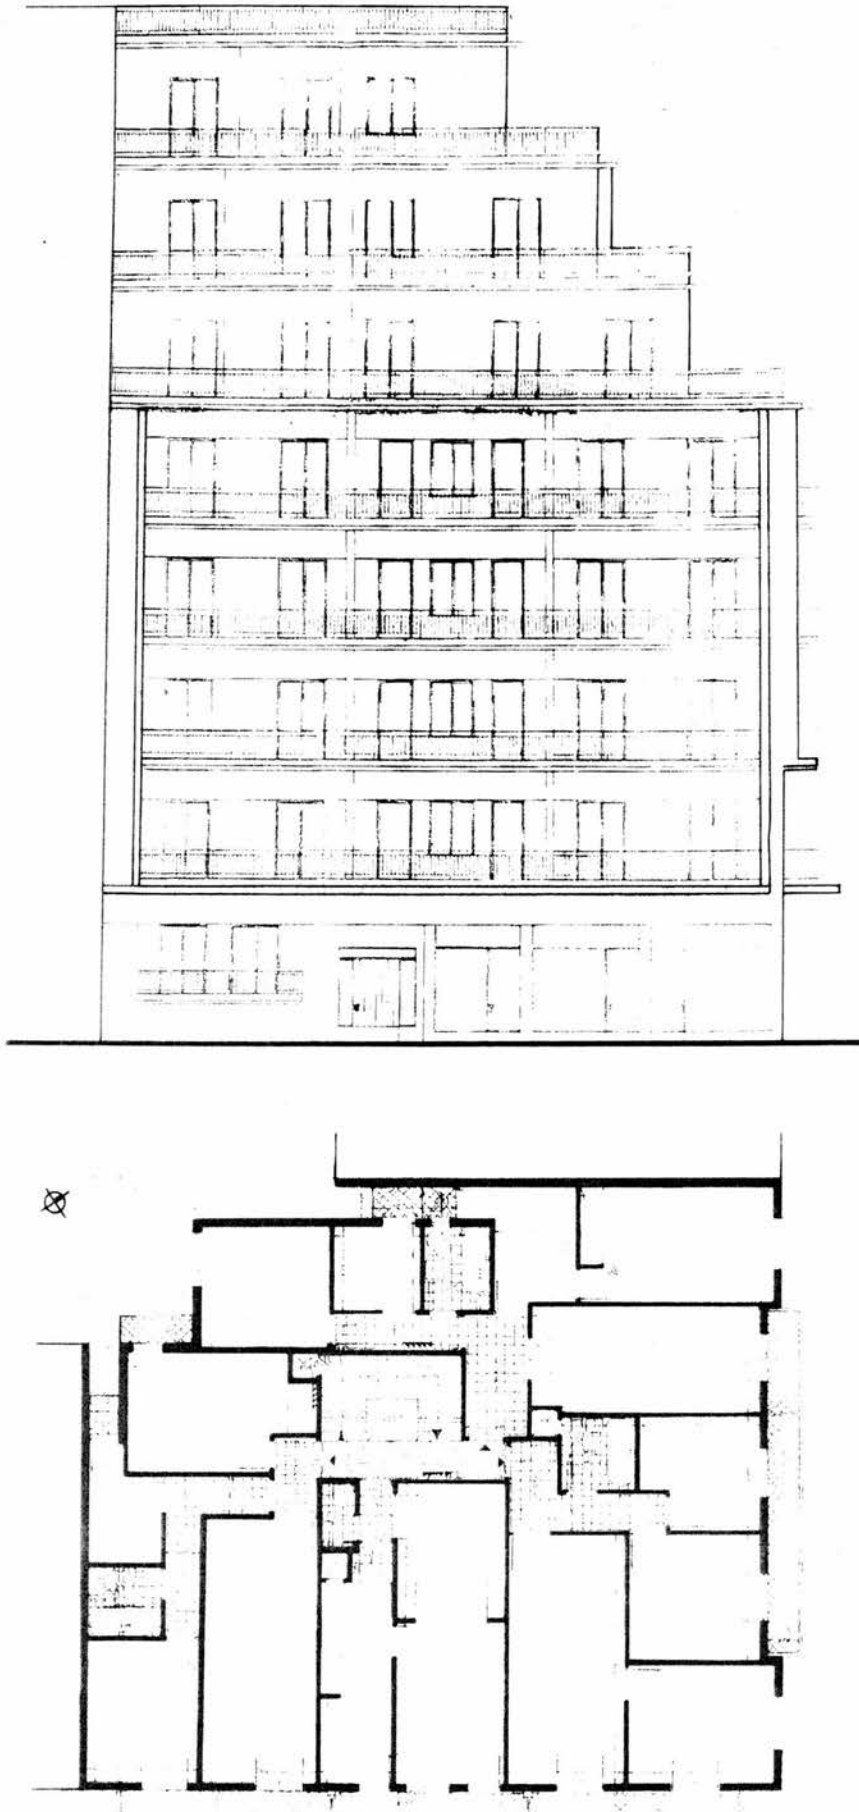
Plan and northwest street facade of building 4 (scale 1:200)
